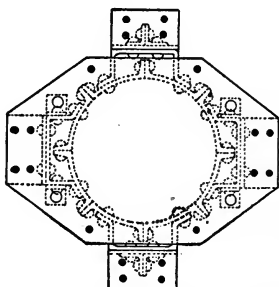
Detail of Phoenix Column used in Old Colony Building.
